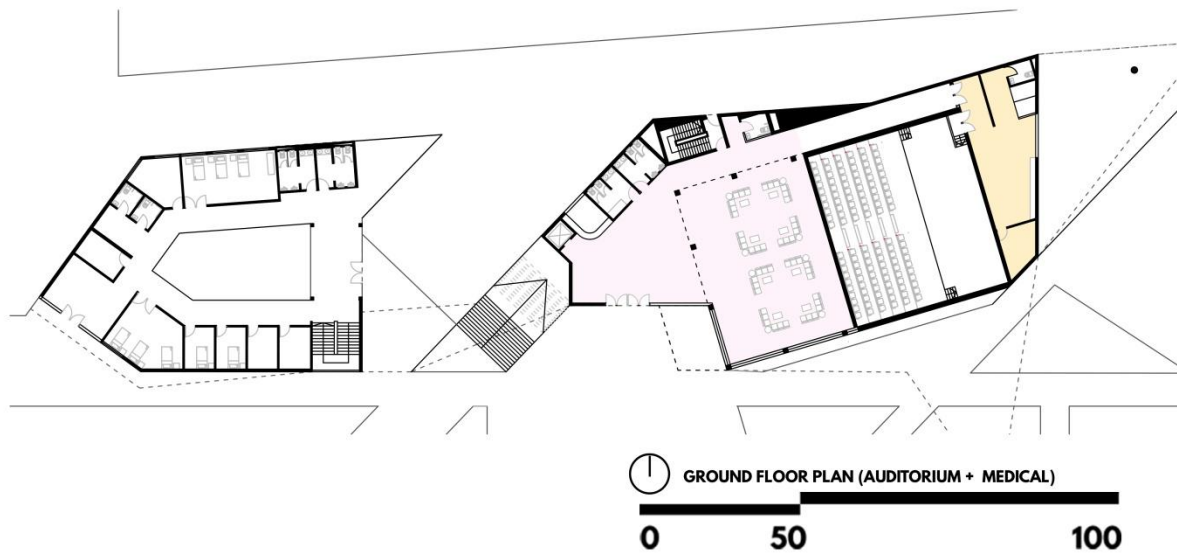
Auditorium and medical facility ground floor plan (Author ,2020)
